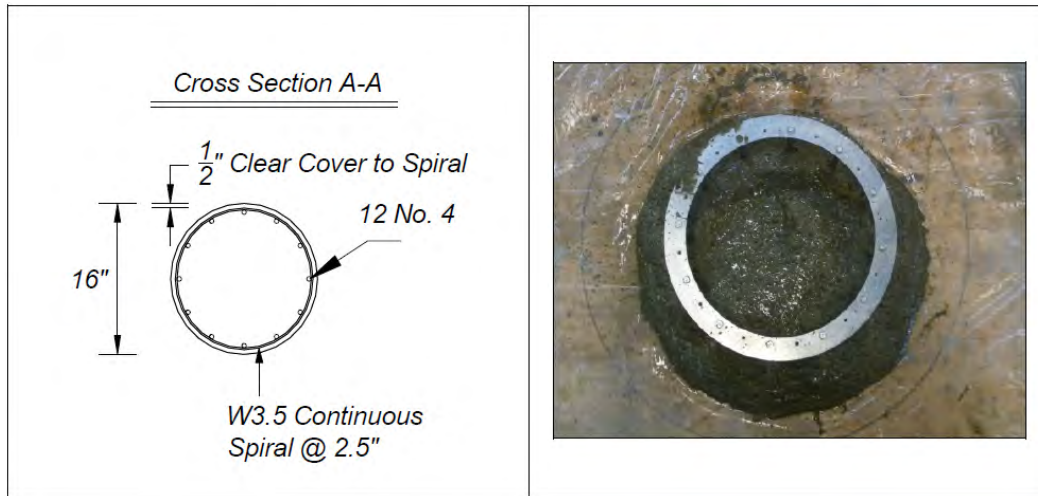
Custom designed J-ring test with same rebar spacing as bridge columns.
